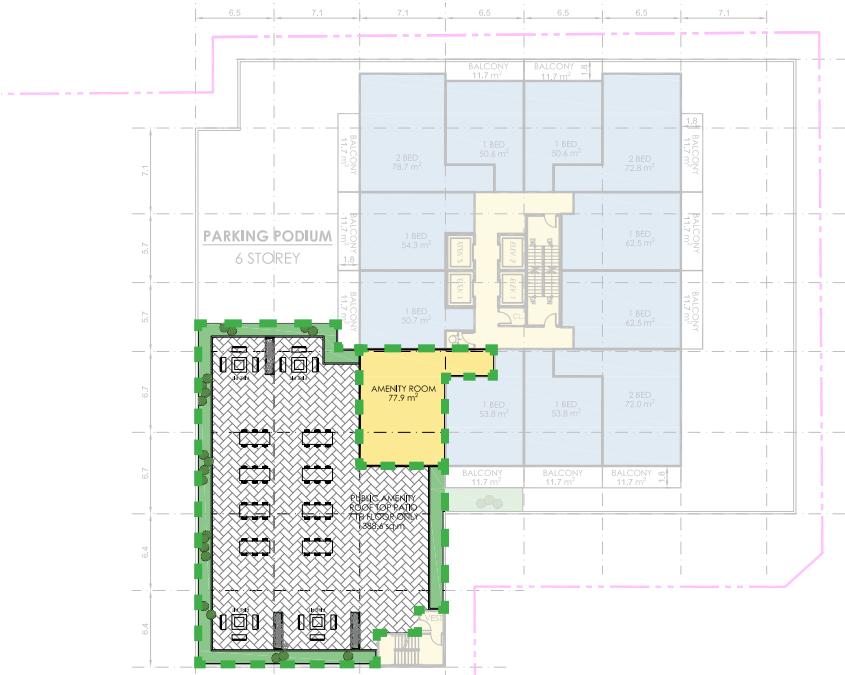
Indoor and outdoor amenity spaces on the podium rooftop
